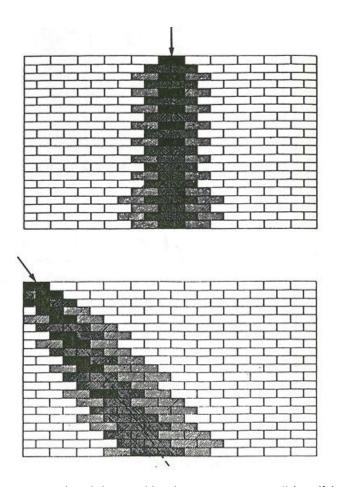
Vertical and diagonal load on a masonry wall (Giuffrè, 1989).
